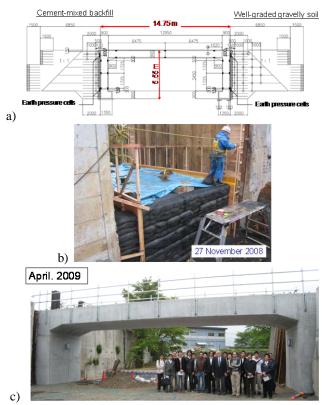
A full-scale model of GRS integral bridge under construction (Nov. 2008) at Railway Technical Research Institute, Japan: a) dimensions; b) abutment under construction; and c) completed model.
